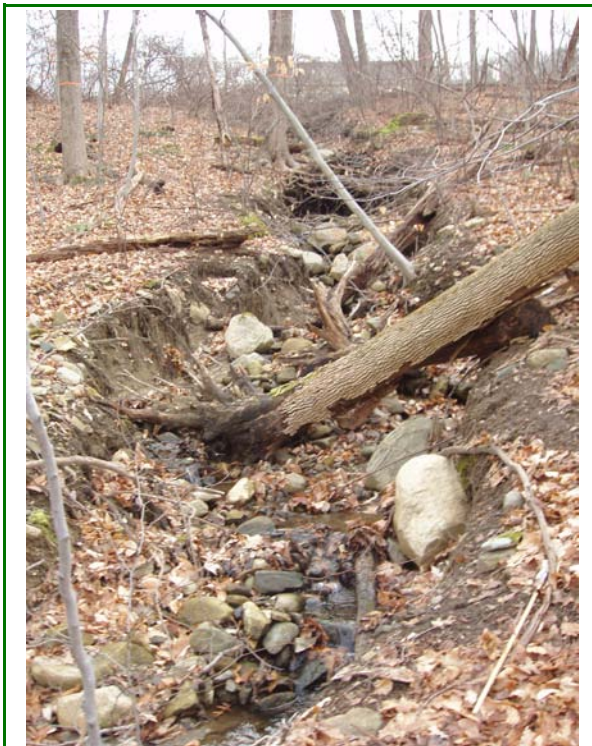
Site WB-1, West Branch: Joseph Court. Stormwater remediation will include repair of severely eroded channel on steep slope and installation of catch basin(s), stormwater drainage pipe, outlet protection and vegetation. The project is currently in the design phase.
